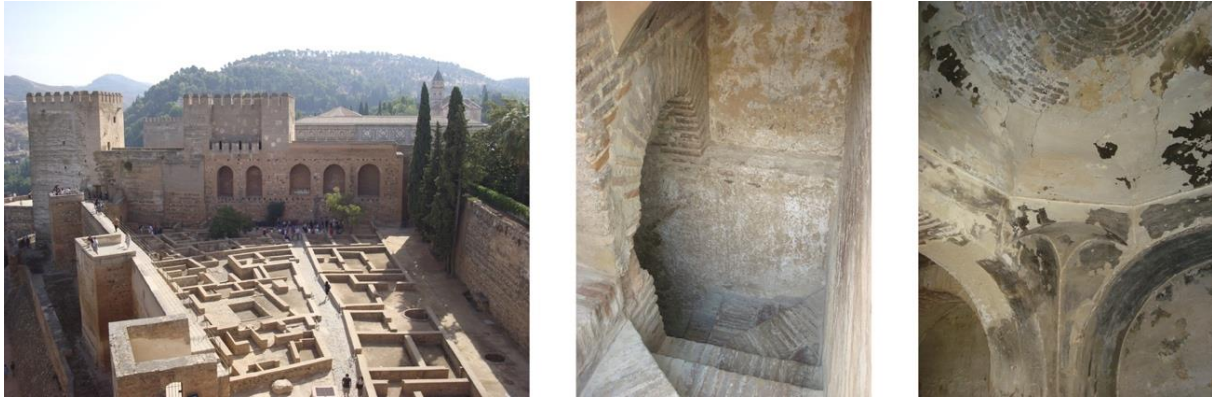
East front elevation of the enclosure. Interior of the Tribute Tower
